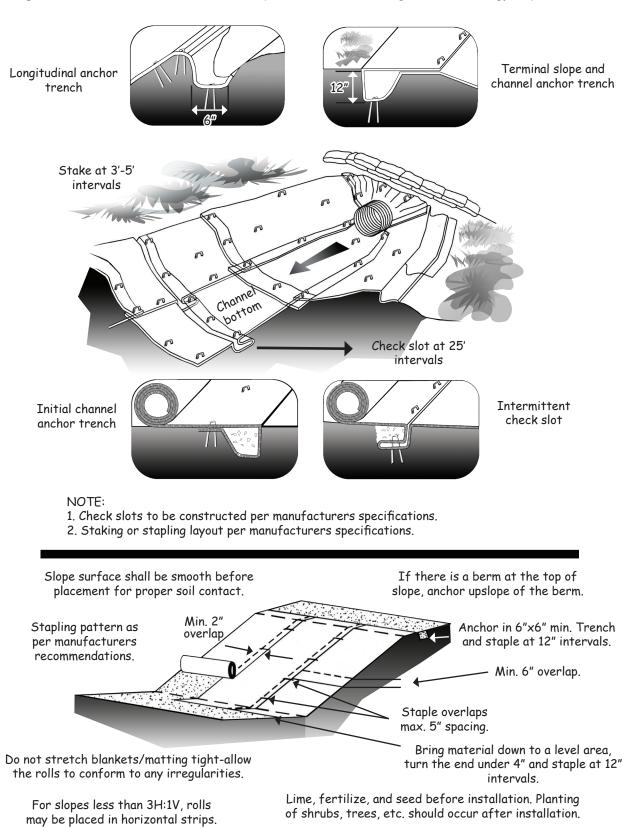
Channel Installation and Slope Installation; Washington State Ecology Department
